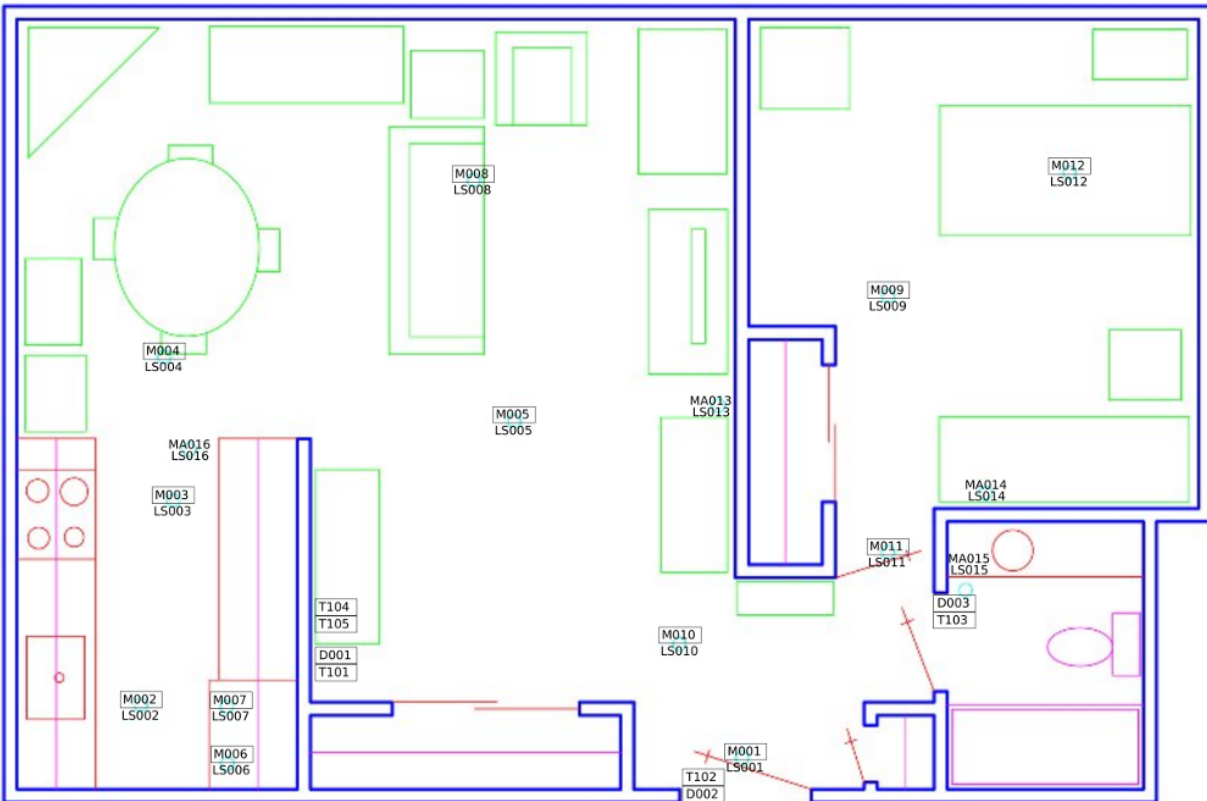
Floor plan and sensor placement for the testbed hh101.
